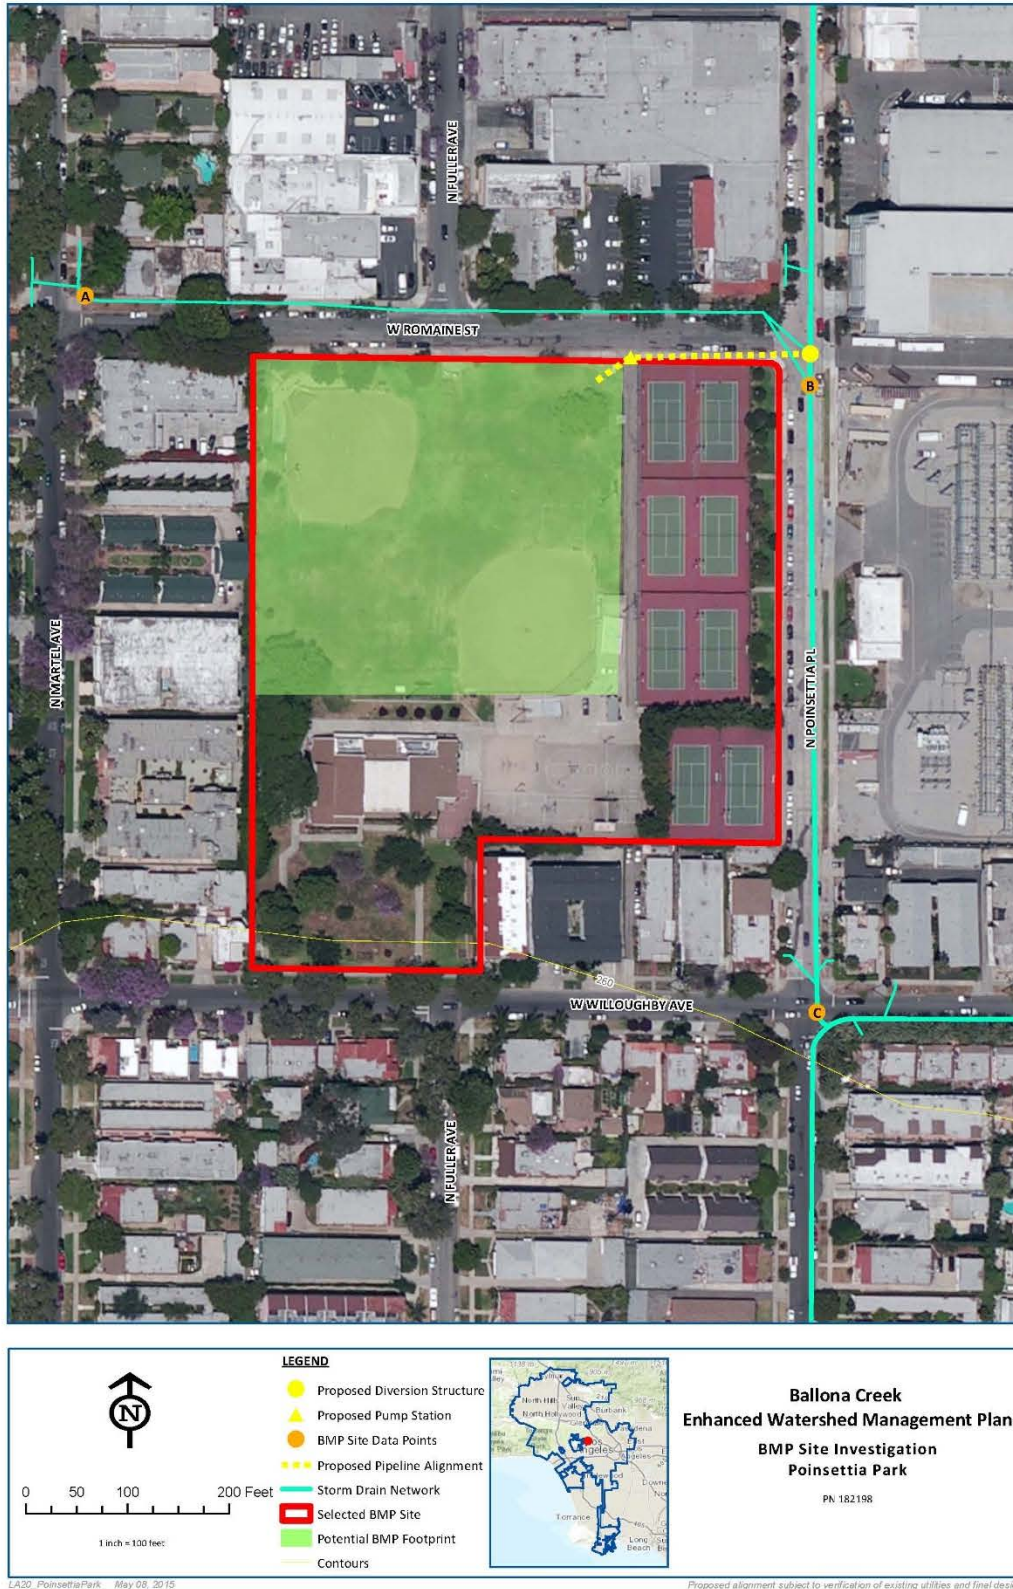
Poinsettia Park Subsurface Infiltration Site – Site Map
